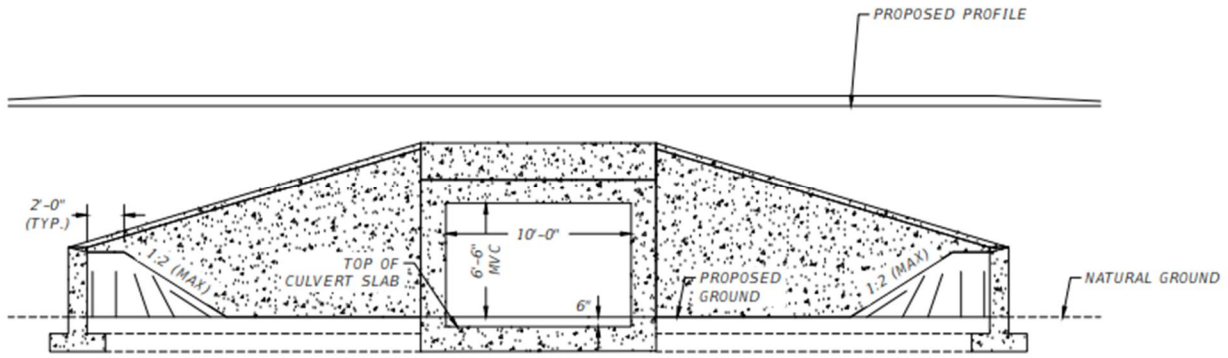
Build Alternative Wildlife Crossing Bridge Typical Section
